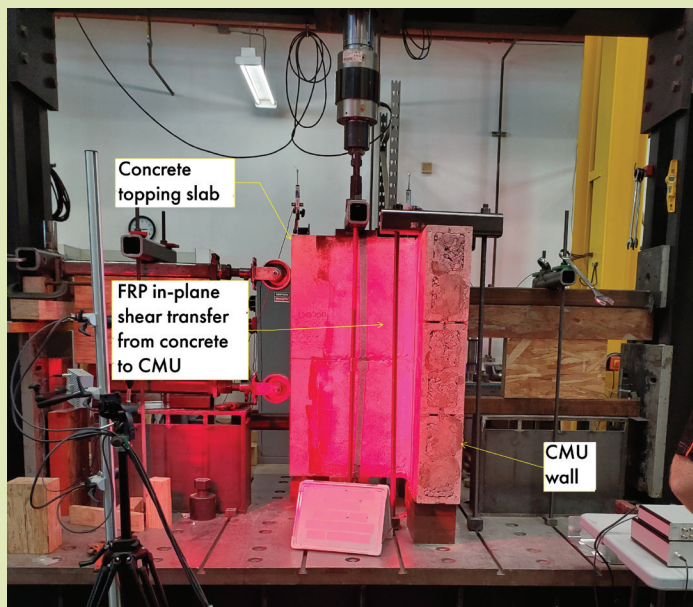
FRP testing is performed for concrete topping slab to CMU wall in-plane shear transfer. Credit Simpson Strong Tie.
